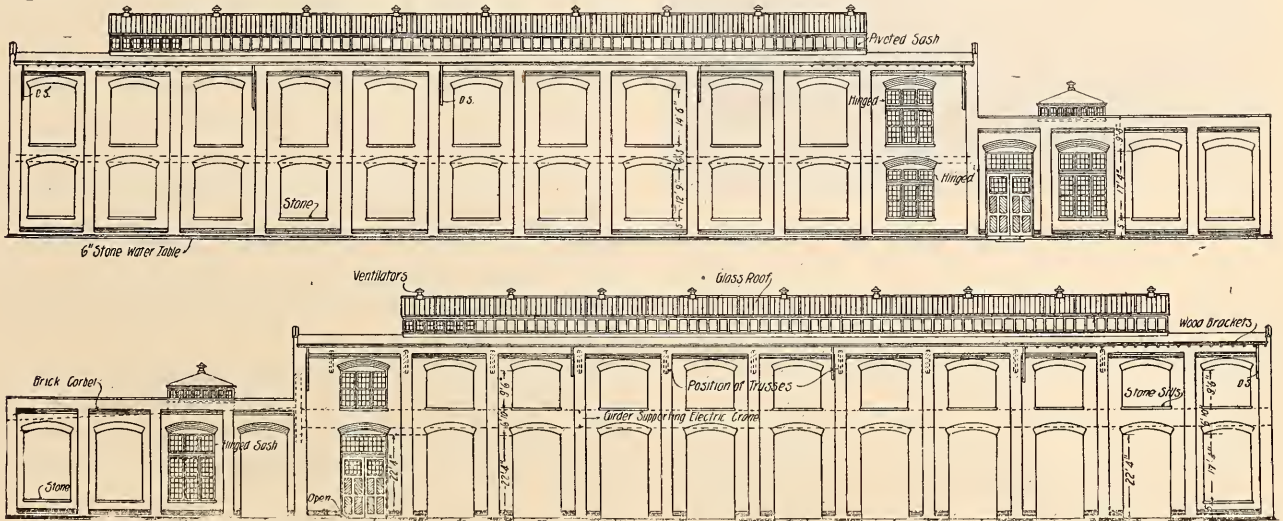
SIDE ELEVATIONS OF LOCOMOTIVE AND MACHINE SHOP—TERMINAL R. R. OF ST. L.
